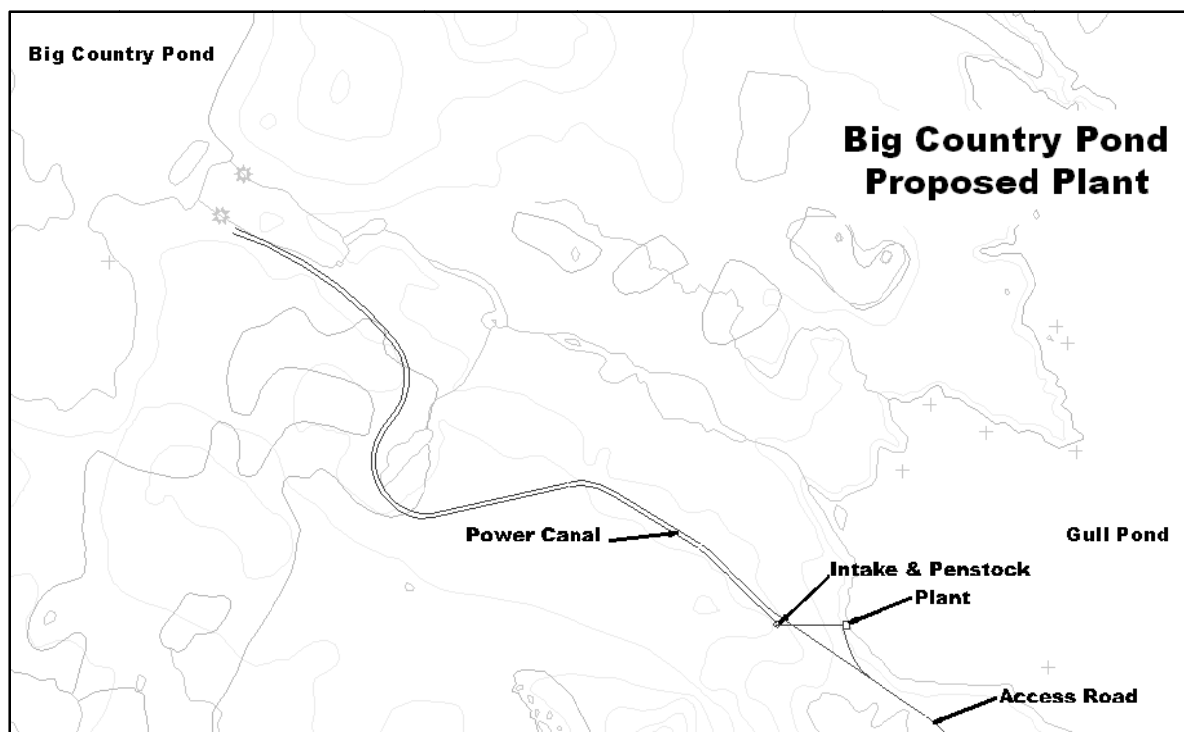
Conceptual Layout of Proposed Plant at Big Country Pond
